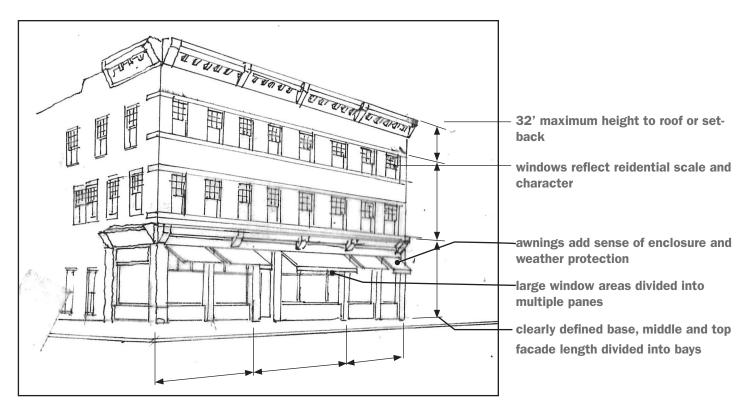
Character guidelines for 3-story mixed-use infill building
